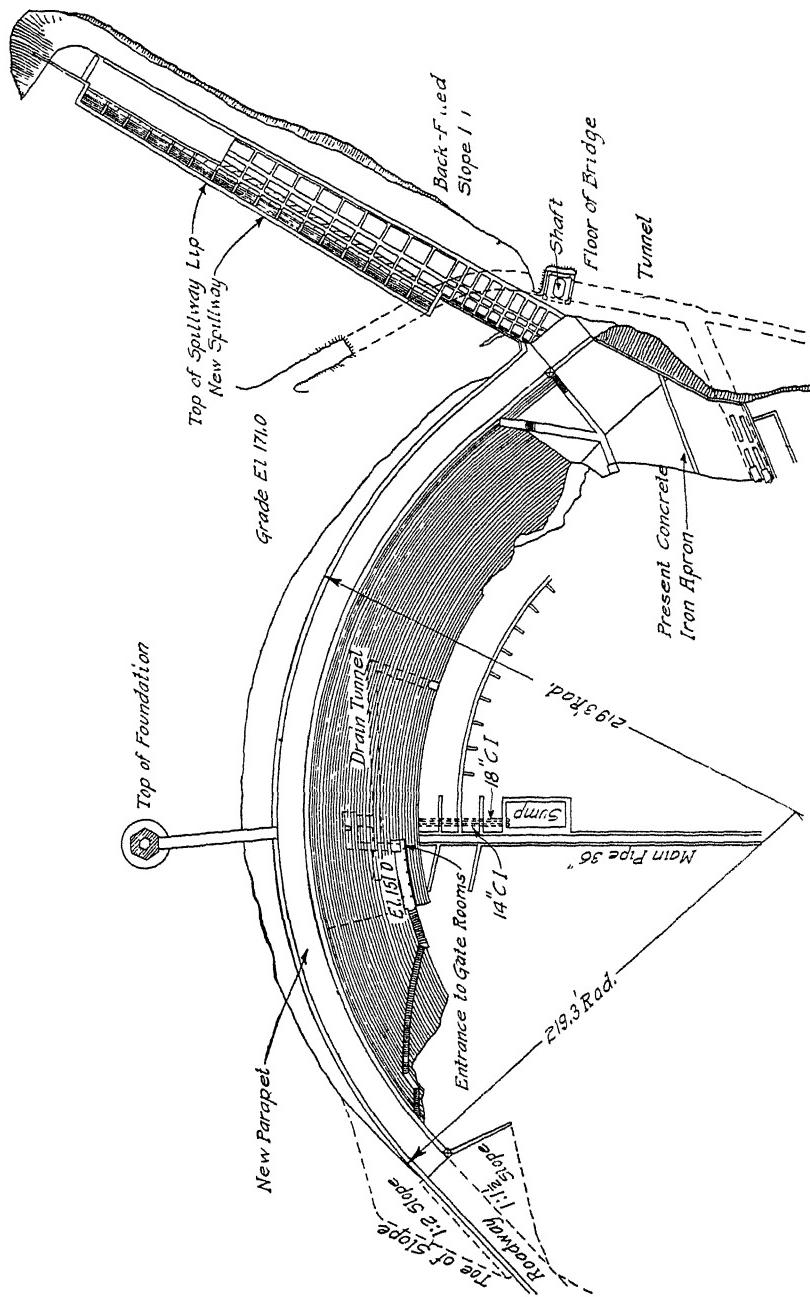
Location Plan of Sweetwater Dam, Showing Alterations
